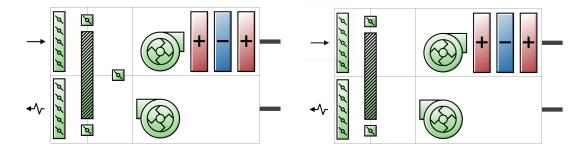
Classroom rooftop system diagram (left) and hallway and restrooms rooftop system diagram (right)
